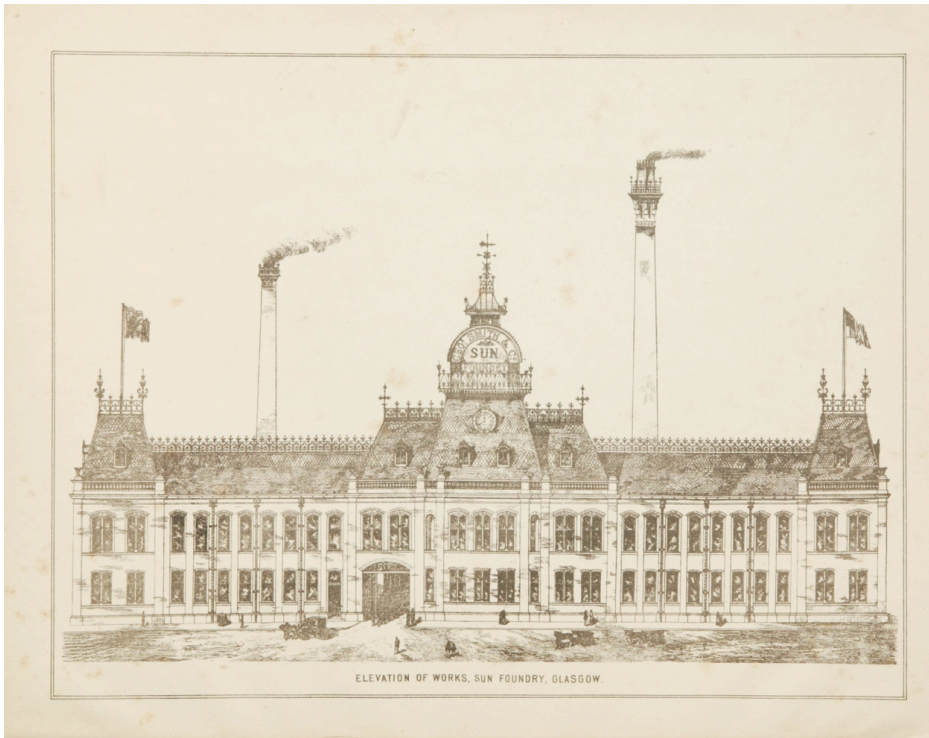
Façade elevation of Sun Foundry at Kennedy Street. Source: Scottish Ironwork Foundation, ‘The Sun Foundry of George Smith and Co, Kennedy Street, Glasgow’,
